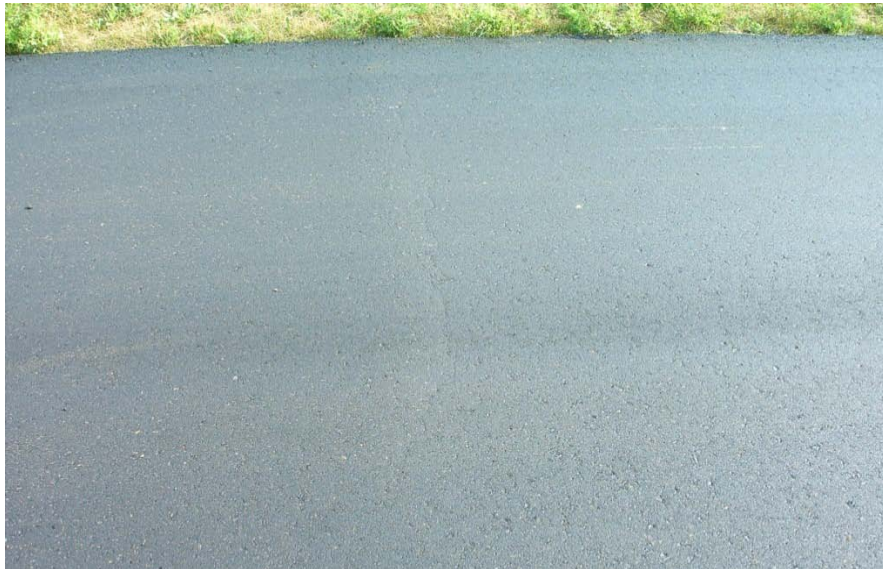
Bump Cracked Open over Unleveled Crack, Eastbound CSAH 15.
